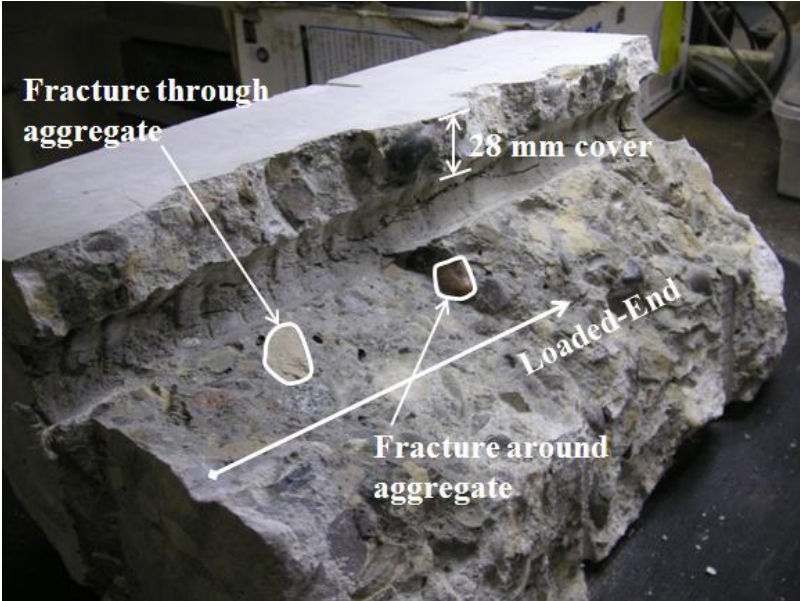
Main failure planes through concrete cover (dissected BE-NAC-50-375A)
